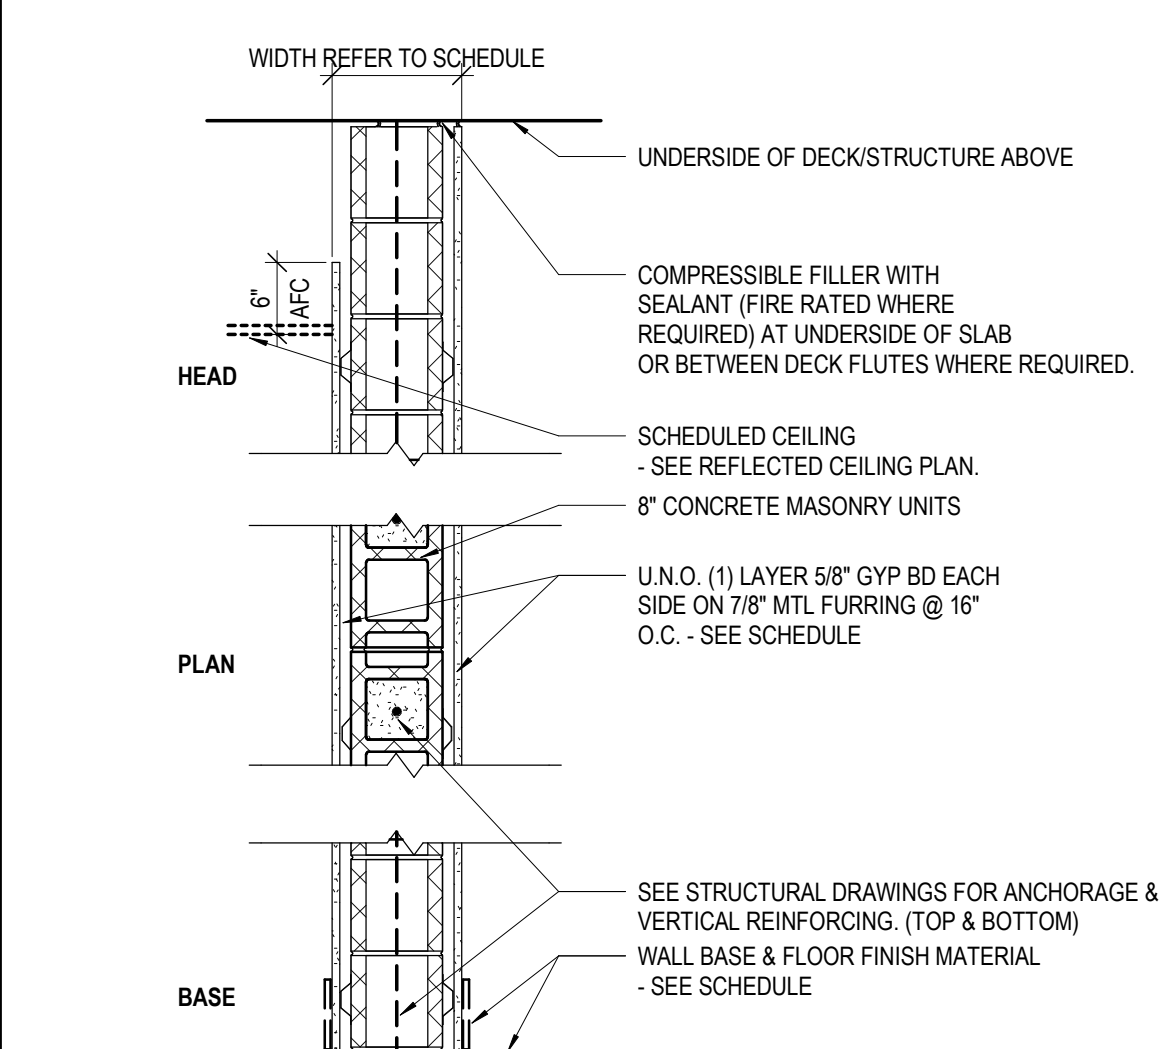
FIRE BARRIER AT EXTERIOR WALL
